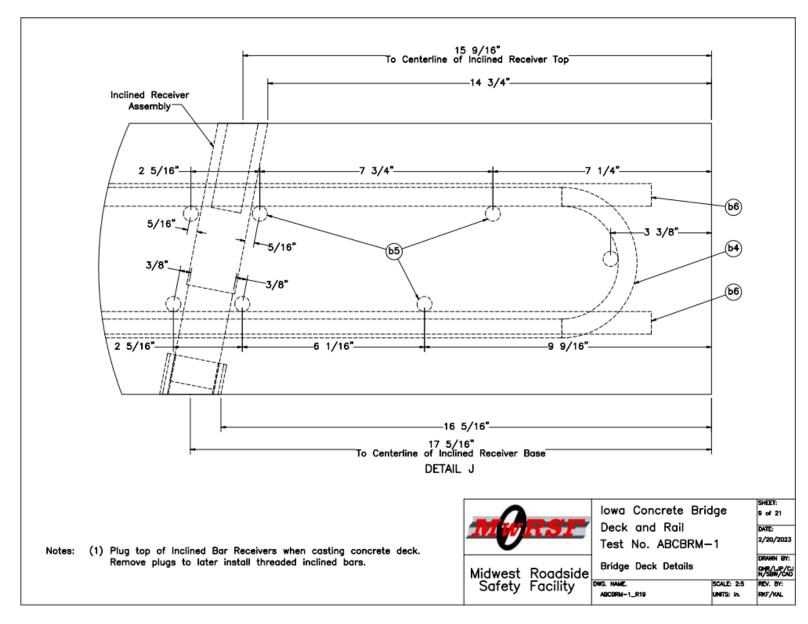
Bridge Deck Details, Test No. ABCBRM-1
